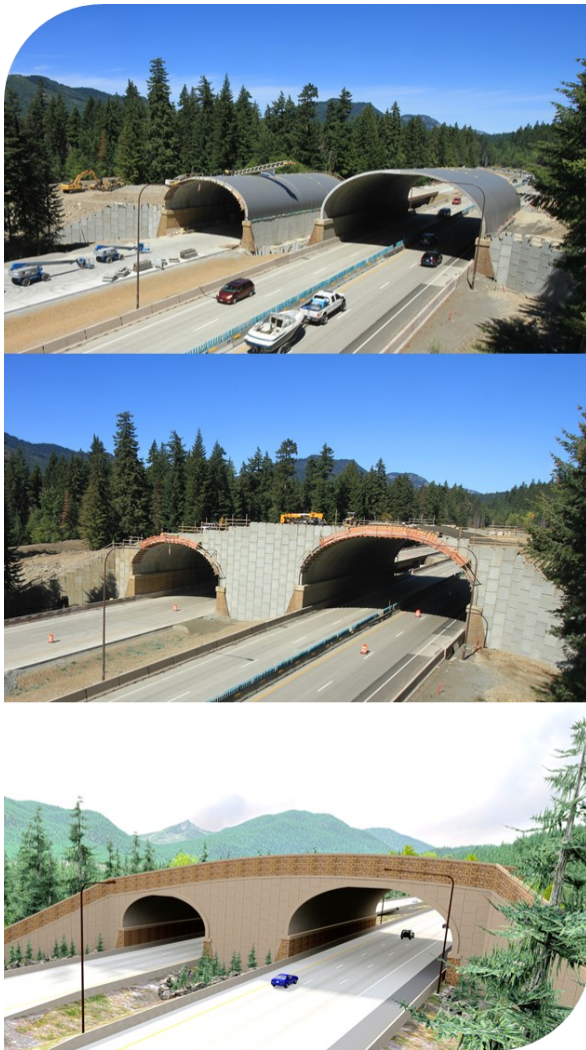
Keechelus Wildlife Overpass (47 m width, ca. 90 m length) concrete archway on IH-90 east of Keechelus Lake, Washington: construction progress and perspective drawing (Washington State DOT 2019)
